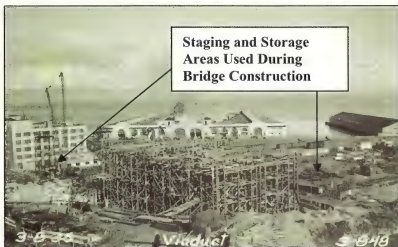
SFO Bay Bridge, Western Anchorage, view east. 300 Spear Street Project area not depicted in photo.
